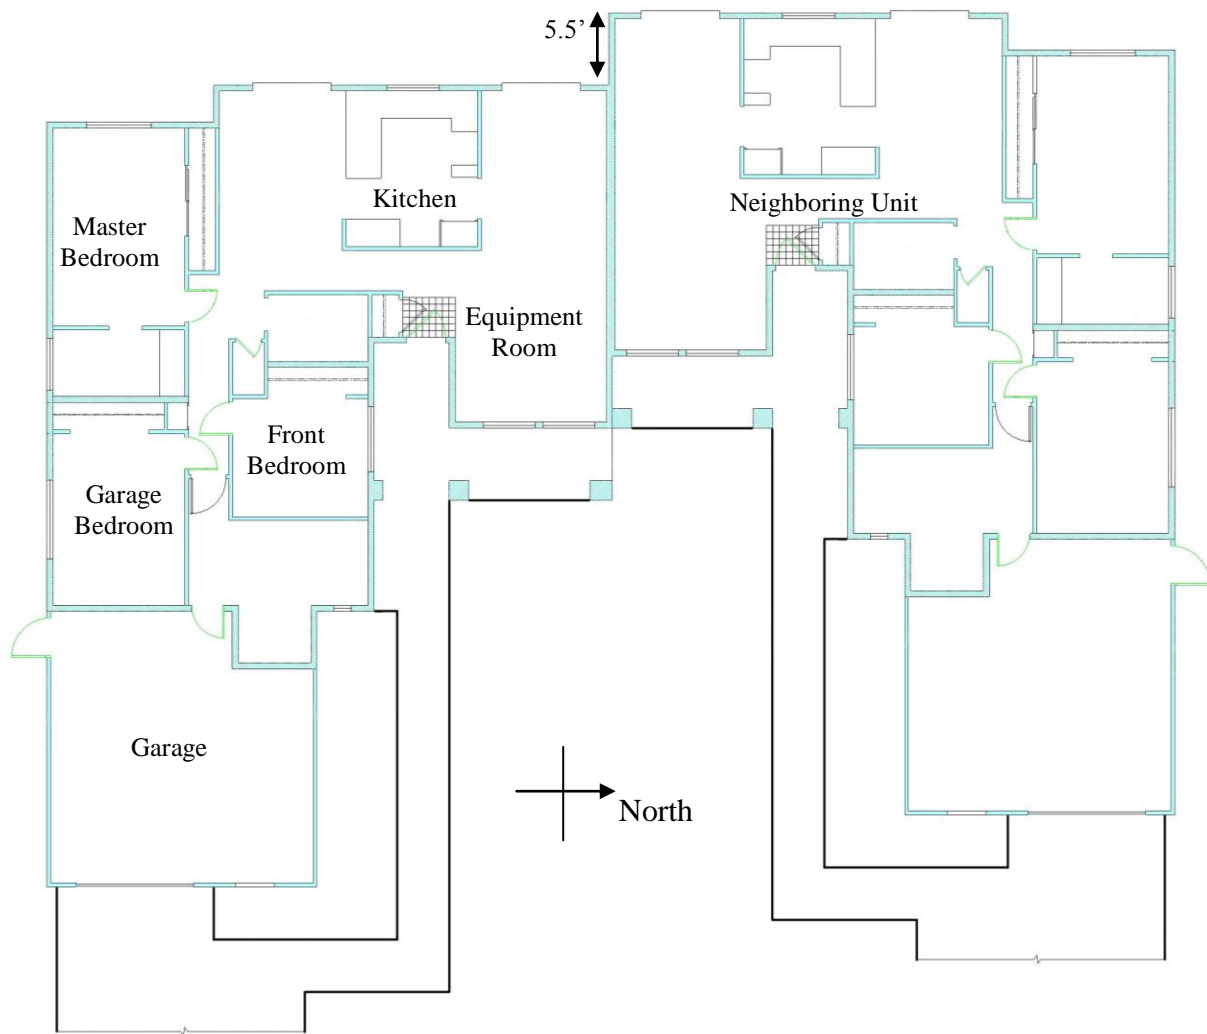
Floor plan of the town house at 52 Blackbird Street illustrating both sides of the house. The floor plans are mirror images of each other, offset by 0.14-meters (5.5-feet).
